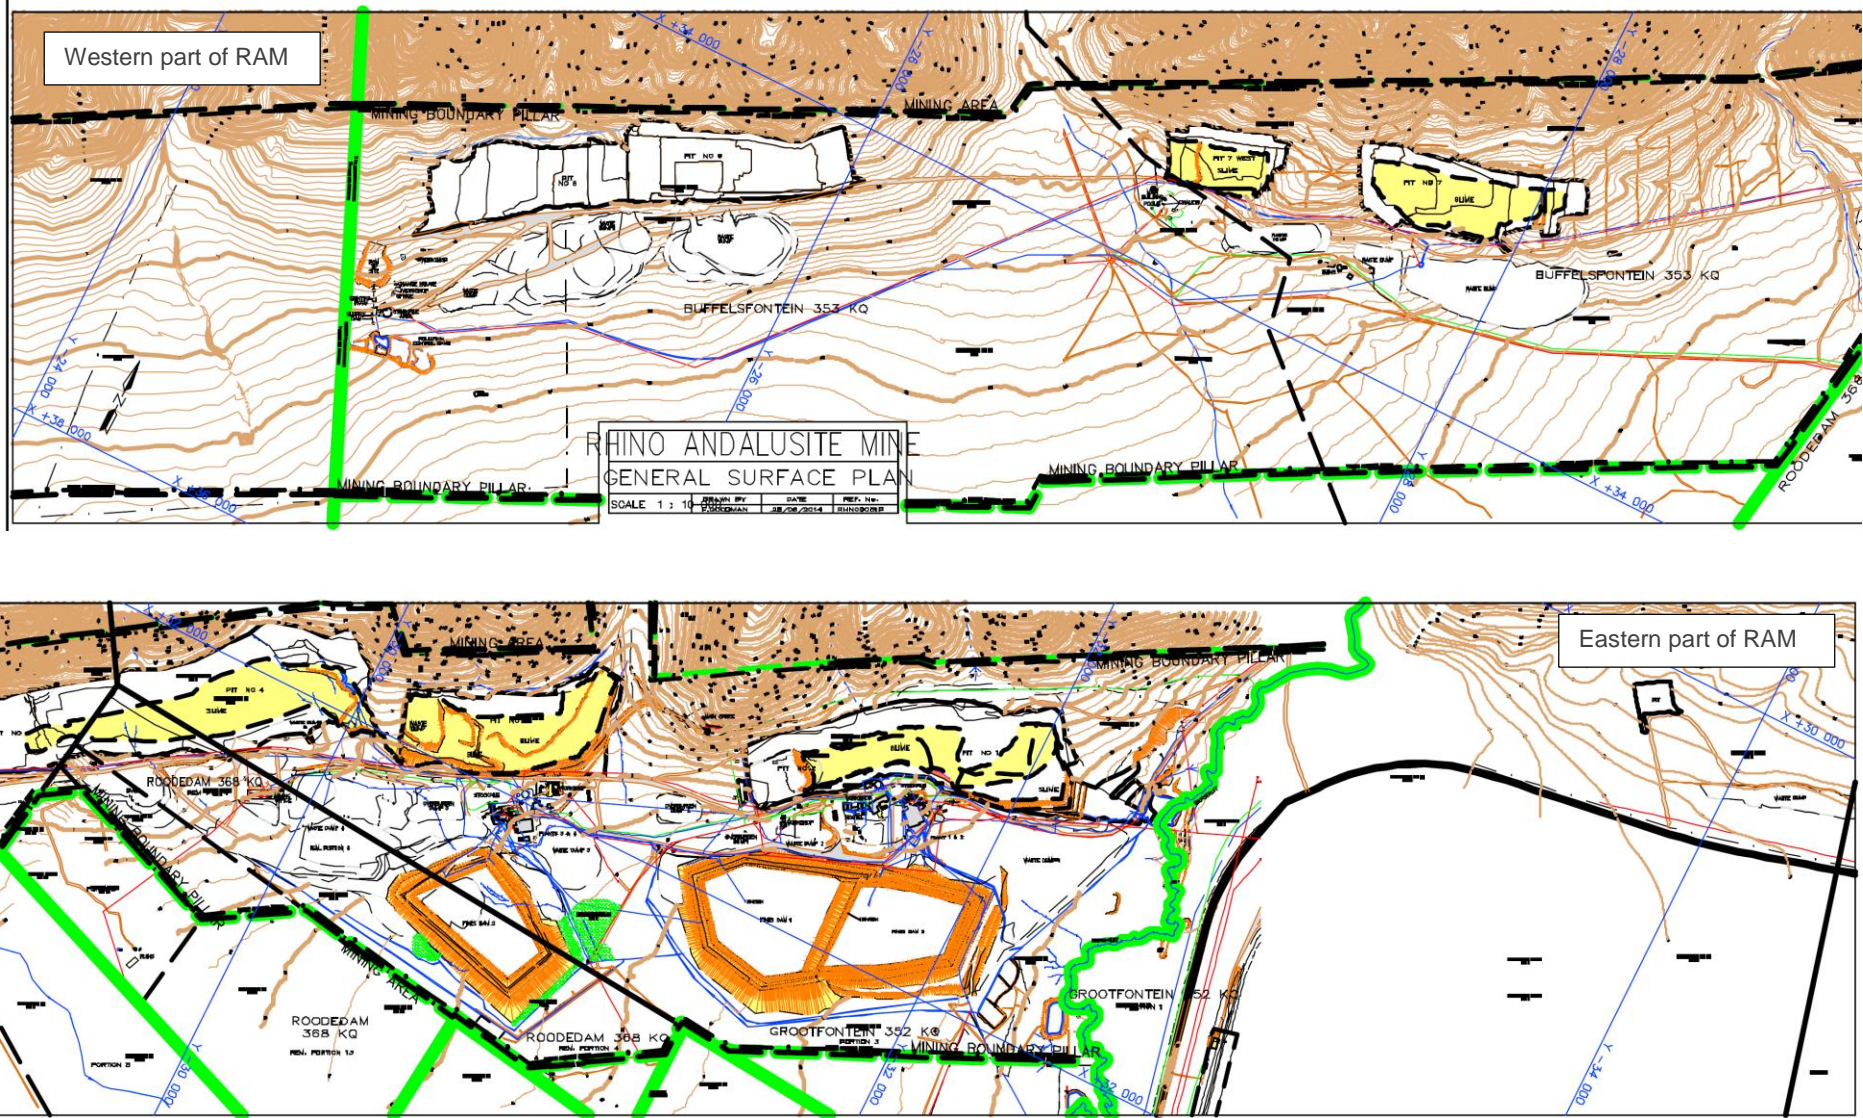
Site layout plan of already existing RAM, this plan has been divided into two parts for easier interpretation (plan attached as Addendum 1D)
